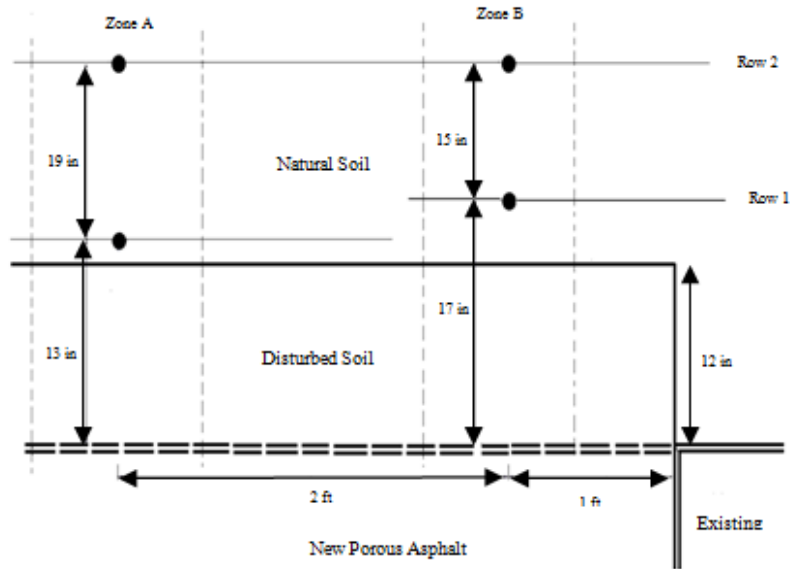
Sensor plan Zones A and B at Finch Arboretum porous asphalt parking lot
